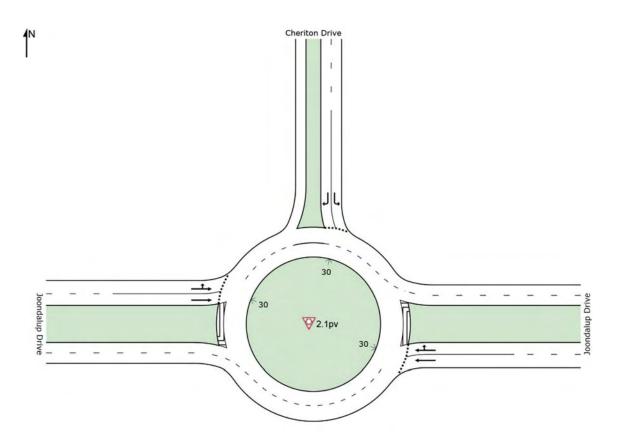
Proposed Roundabout of Joondalup Drive and Cheriton Drive – SIDRA Schematic Geometry
